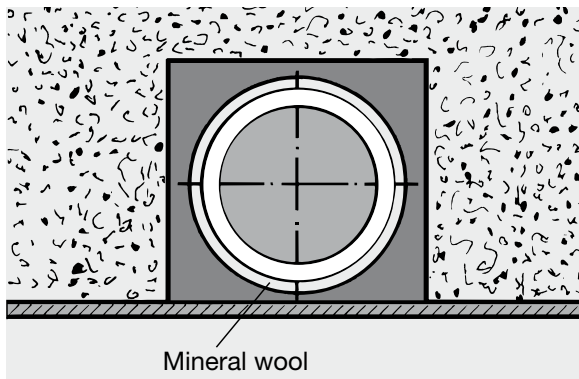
Pipe wrapping to avoid sound bridges between pipe and plaster
